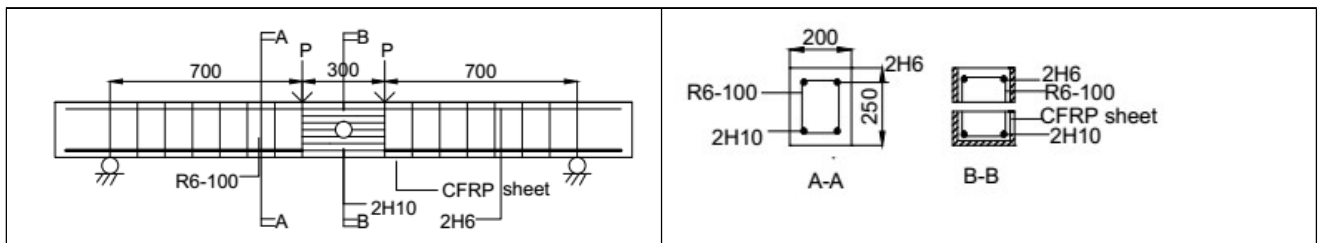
Beam with circular opening strengthened using CFRP sheet.
